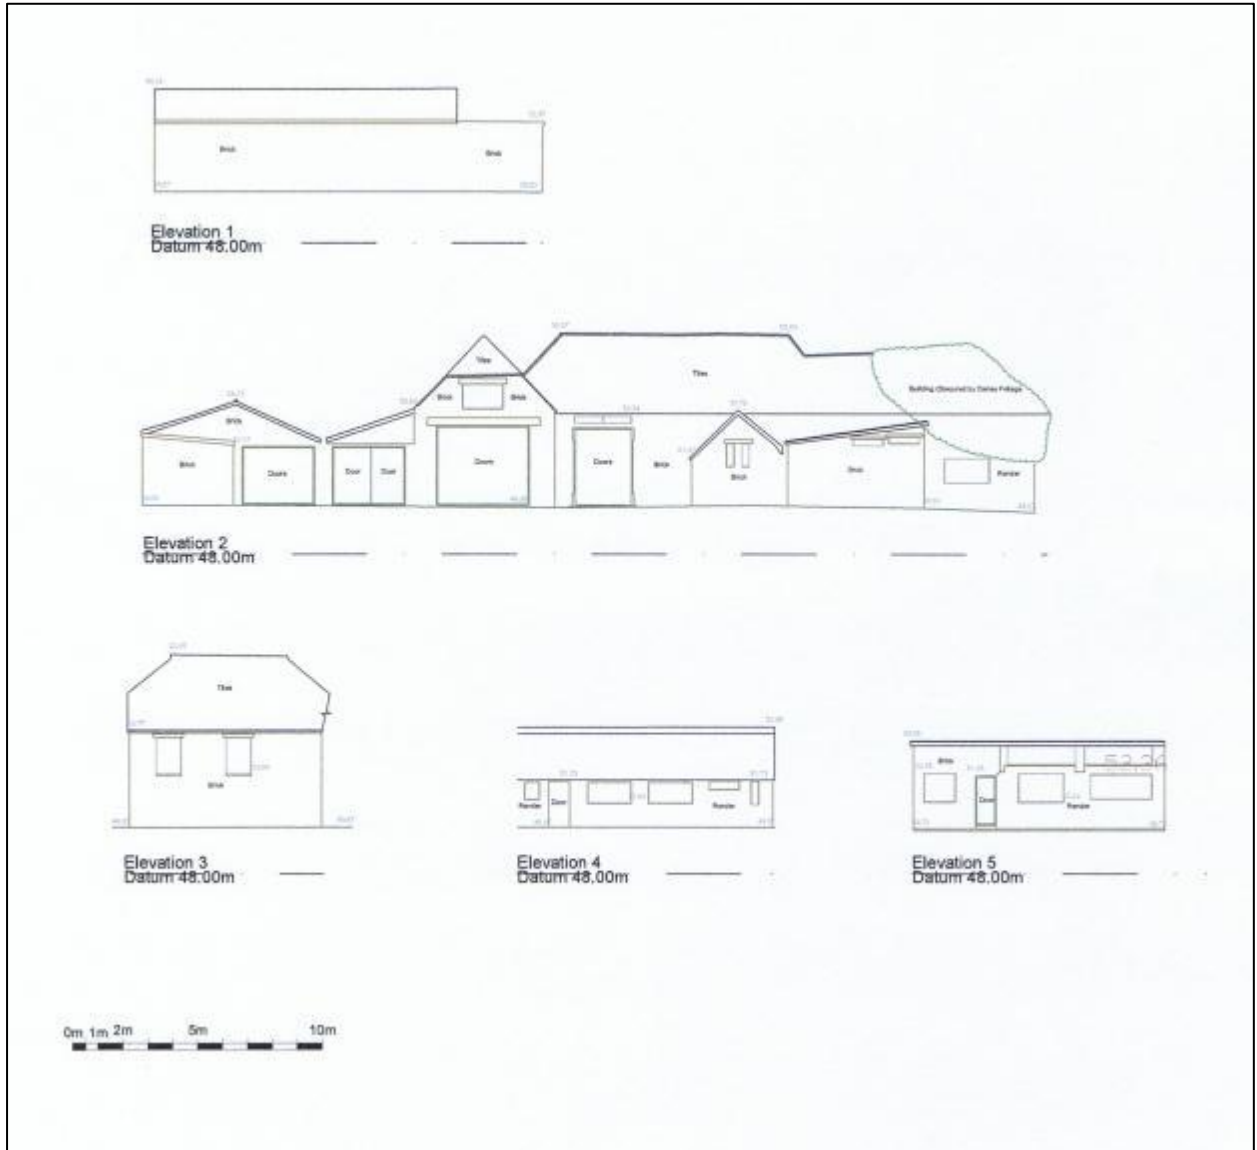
White Horse Barn, Ripley: Elevations of the existing buildings
